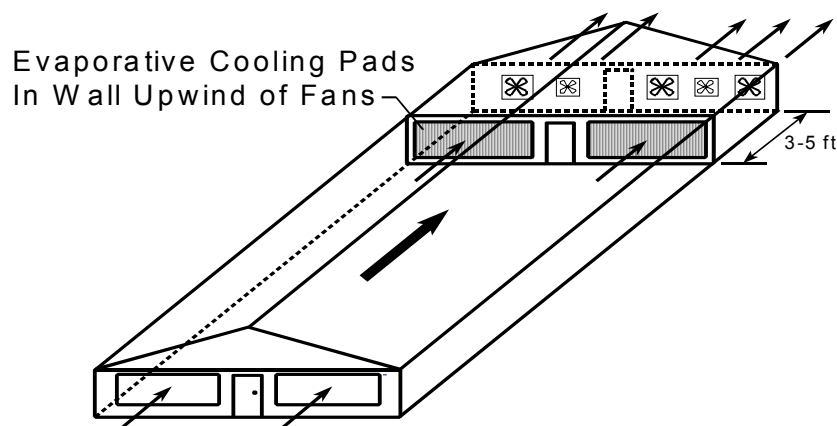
Evaporative cooling pad installed as a wet scrubber in a tunnel-ventilated swine building.
